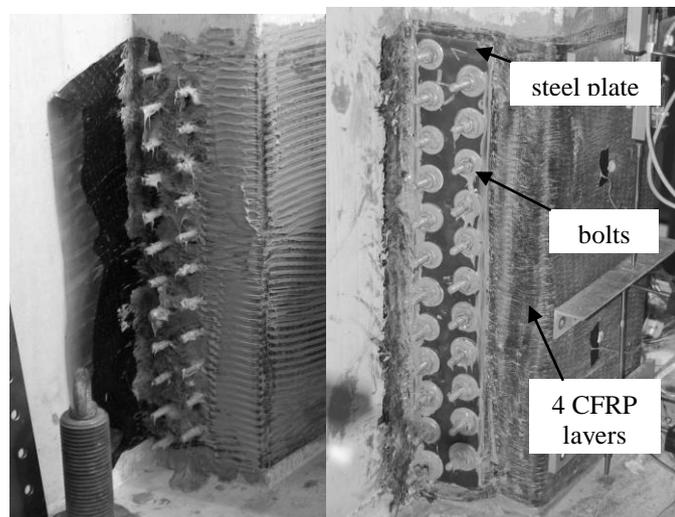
Anchoring of CFRP wrap by bolted steel plate; scheme of the steel plate and bolts
